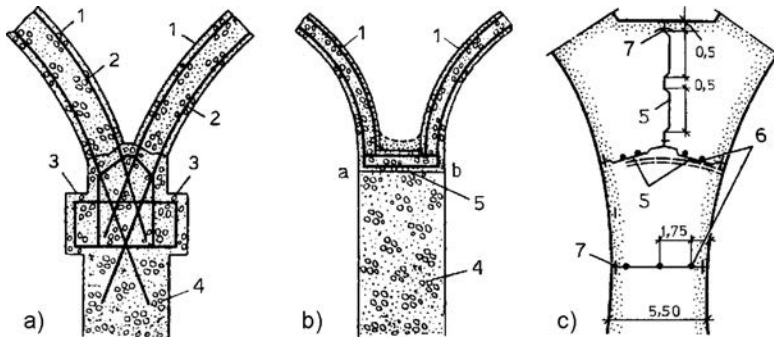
Joint of the arch with the buttress (horizontal section). (1) Arch; (2) reinforcement; (3) support for the formwork; (4) buttress; (5) joint; (6) grouting pipes; (7) waterstops.
